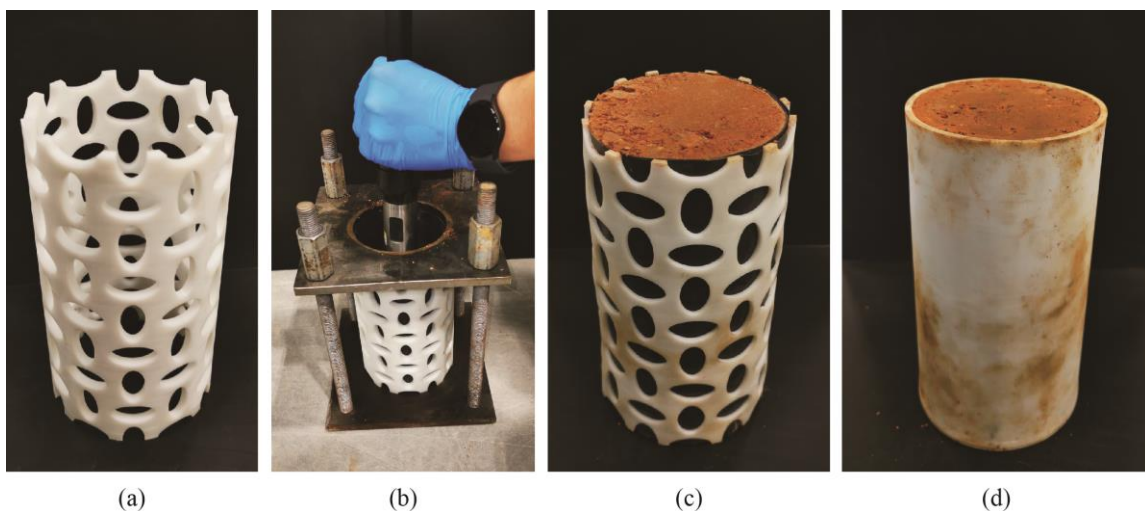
Sample fabrication: (a) SLA 3D printed flexible mold, (b) rammed earth process within the 3D printed mold, (c) final earth sample confined by auxetic mold, and (d) final earth sample confined by conventional continuous mold.
